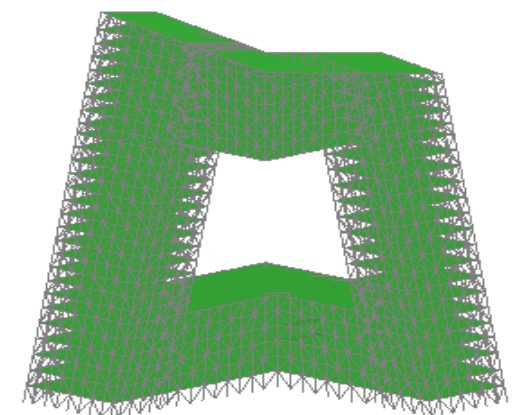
Structural Model for Construction Stages Analysis under Gravity Load
